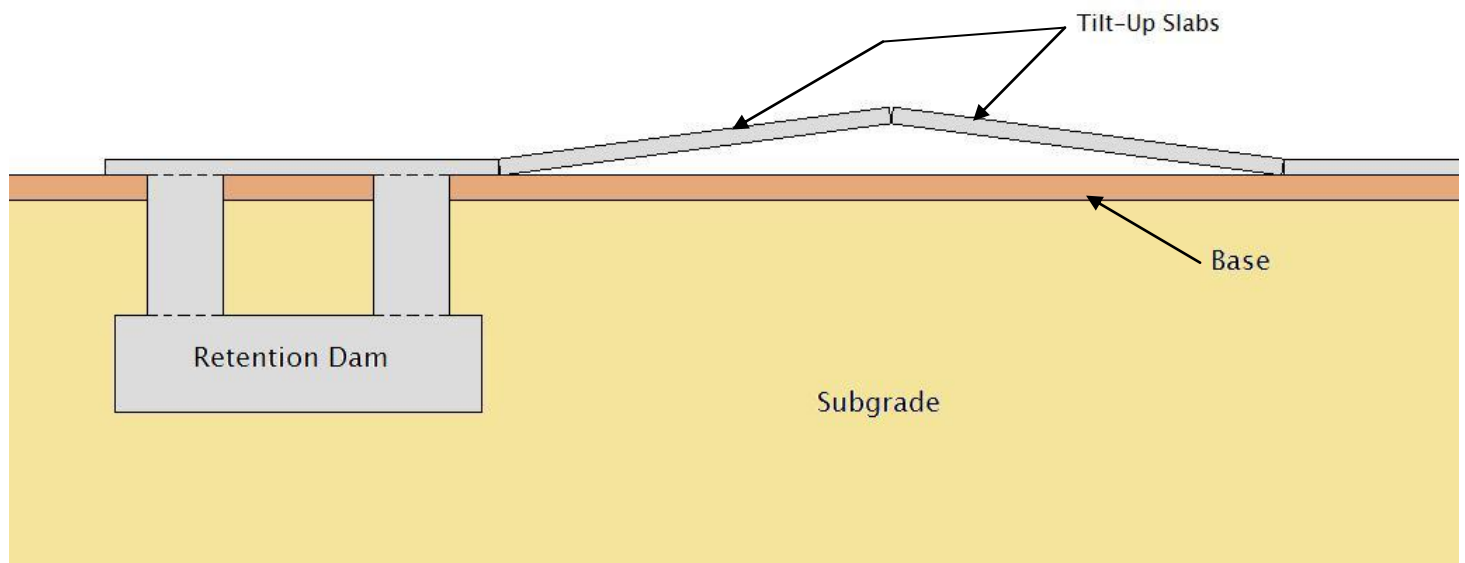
Longitudinal Tilt-up Wedging Pavement Cross Section
